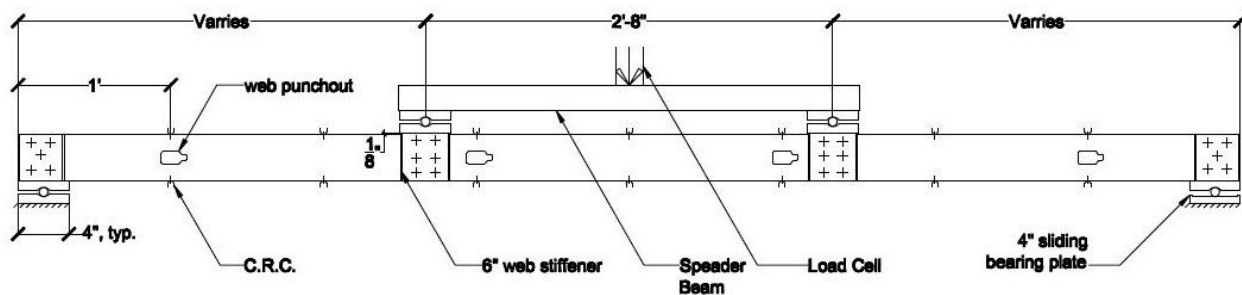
Test set up for $3\frac{5}{8}$ -in specimen showing web stiffeners extending above specimen for 3-D & 3-E.
